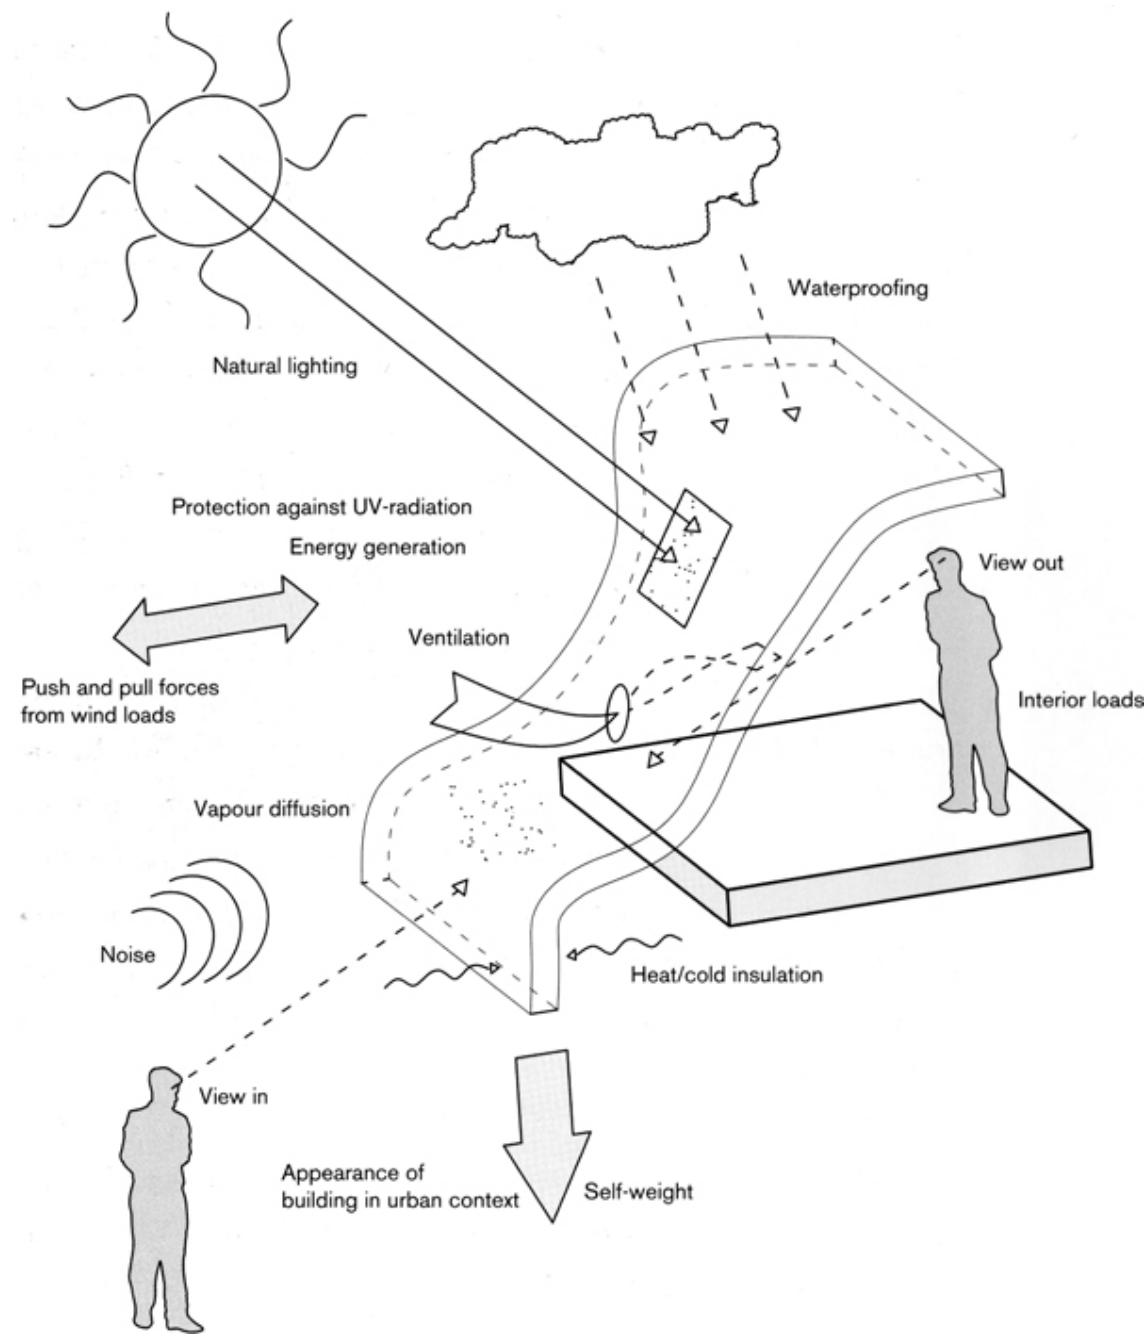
a : Functions of Curtain wall facade. (Knaak, et. al., 2007)
